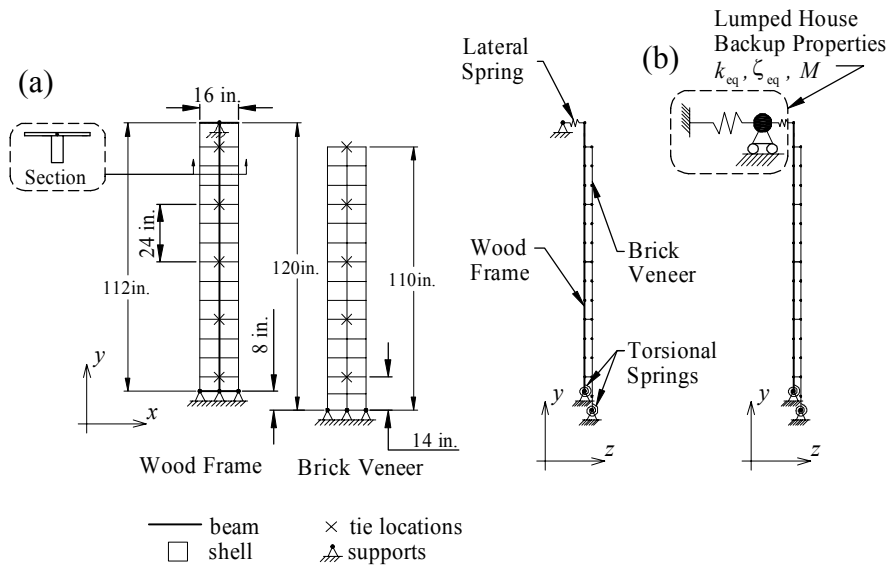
(a) Front and side views of simplified 2-D wall strip model representing a single-story solid brick veneer wall panel. (b) Side view of wall strip with lumped properties representing a house backup structure.
